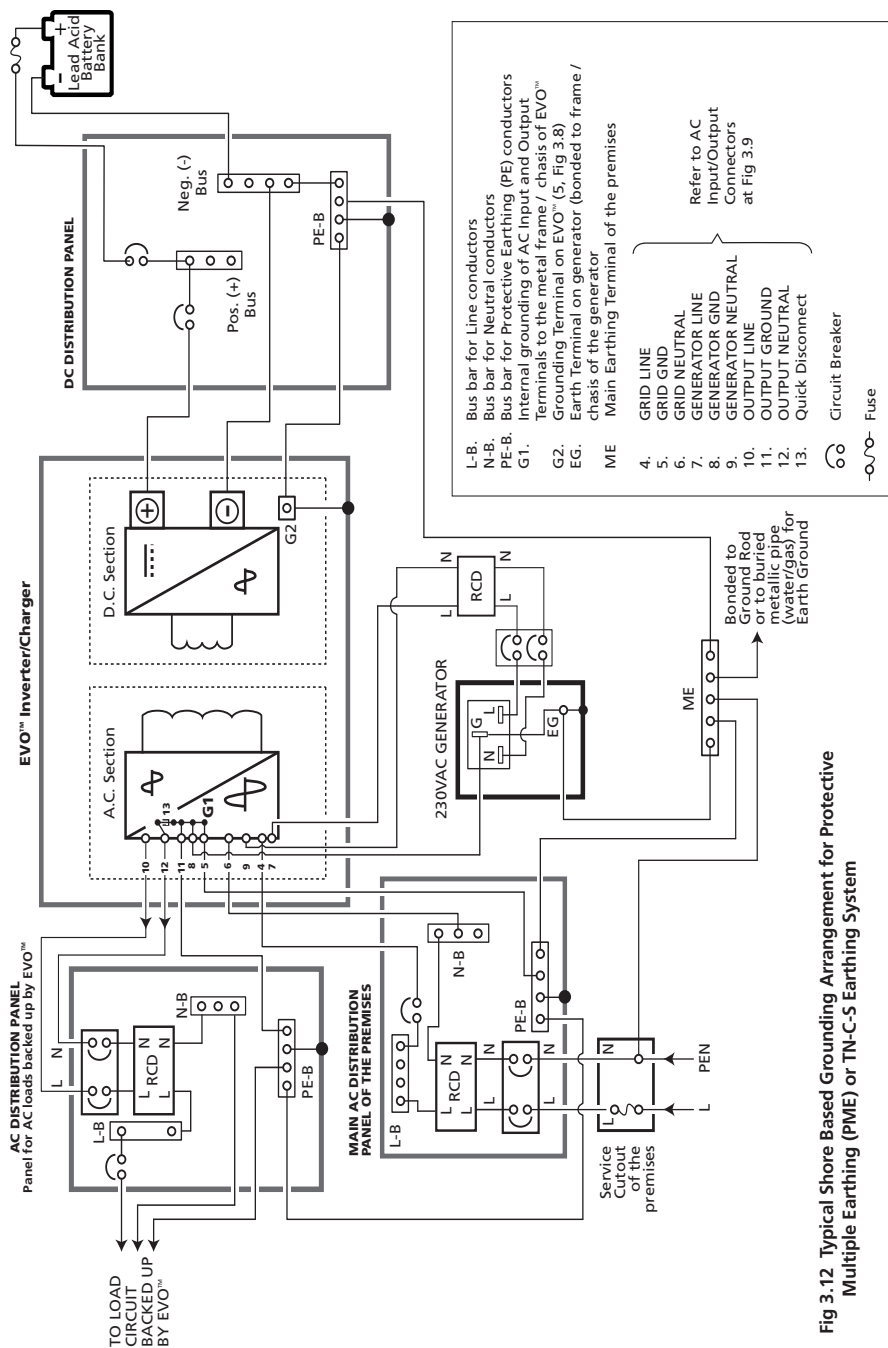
Typical Shore Based Grounding Arrangement for Protective Multiple Earthing (PME) or TN-C-S Earthing System
